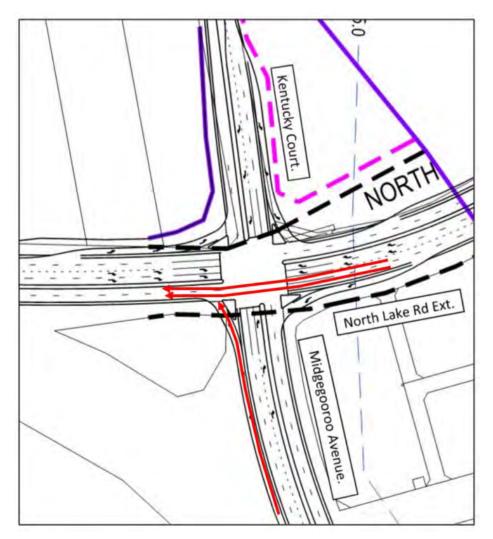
North Lake Road/Midgegooroo Intersection Layout
